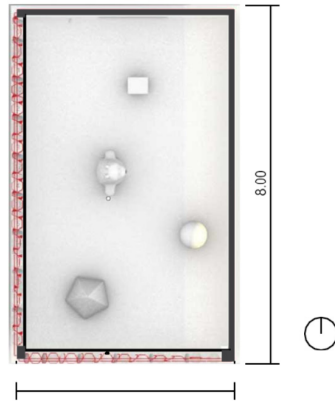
The floor plan of the experimental area installed with adaptive building façade.
